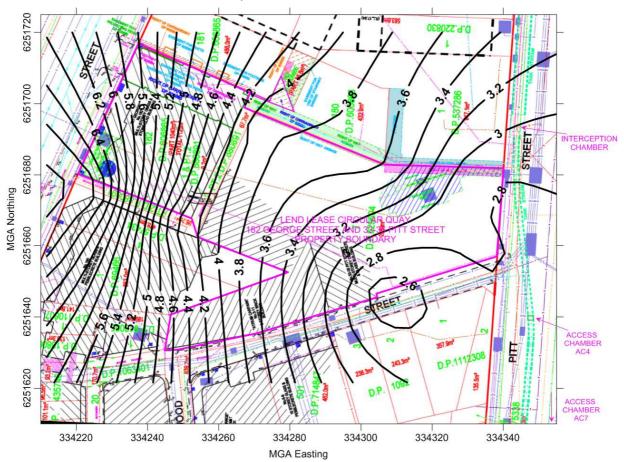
Inferred Elevation of Ground Surface (contours show elevation in metres AHD)
